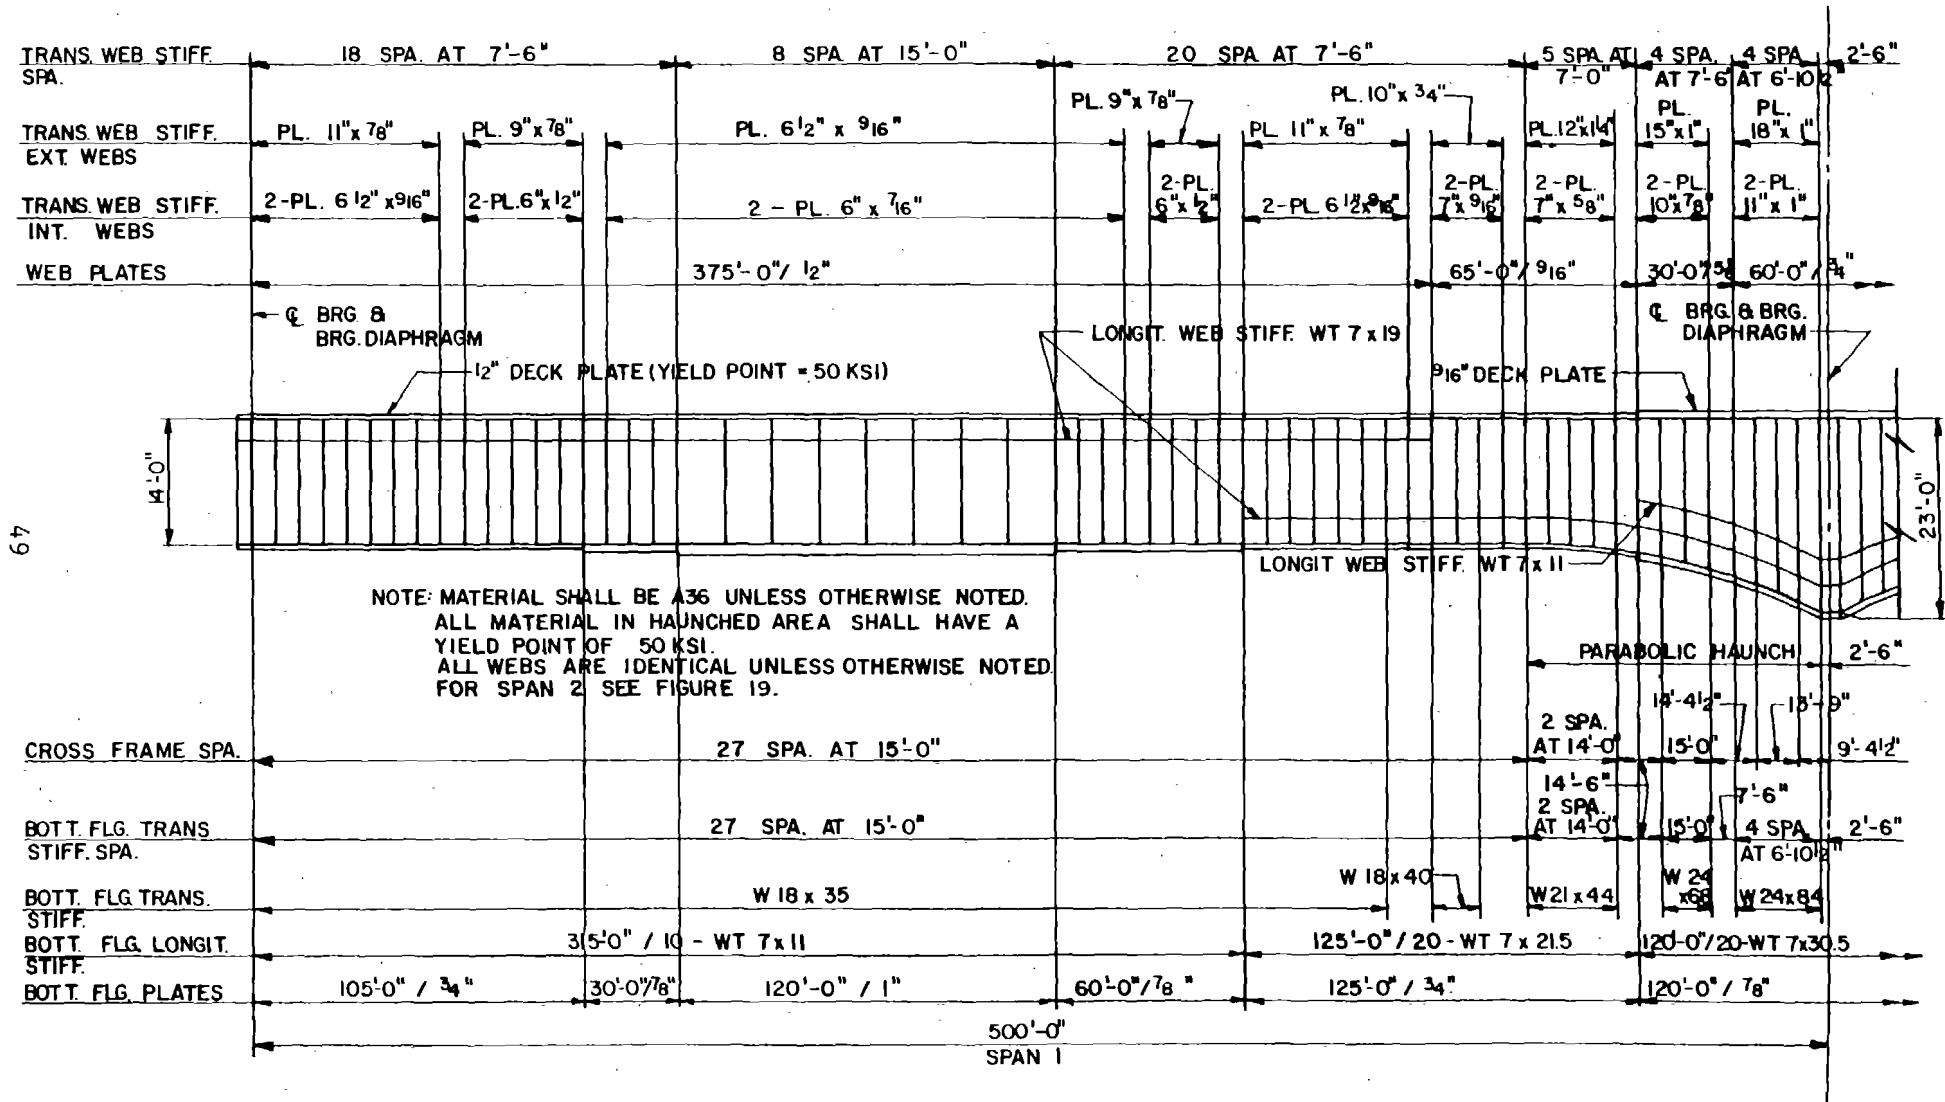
INTERIOR ELEVATION OF GIRDER WEB - PROPOSED SPECIFICATION - LONG SPAN
